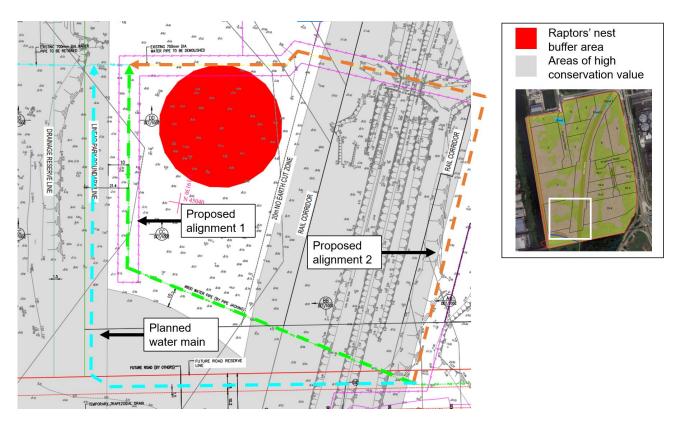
Existing plan and proposed diversion of water main (Source: CPG)
